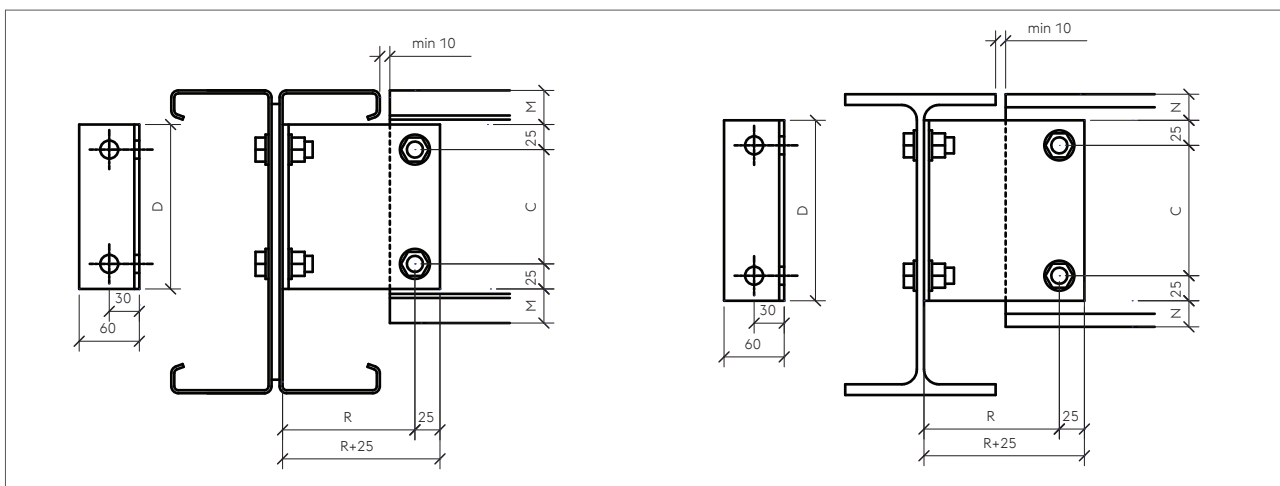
Detail of the connection of one M-type secondary beam to a girder made of C+ sections or an IPE section.
